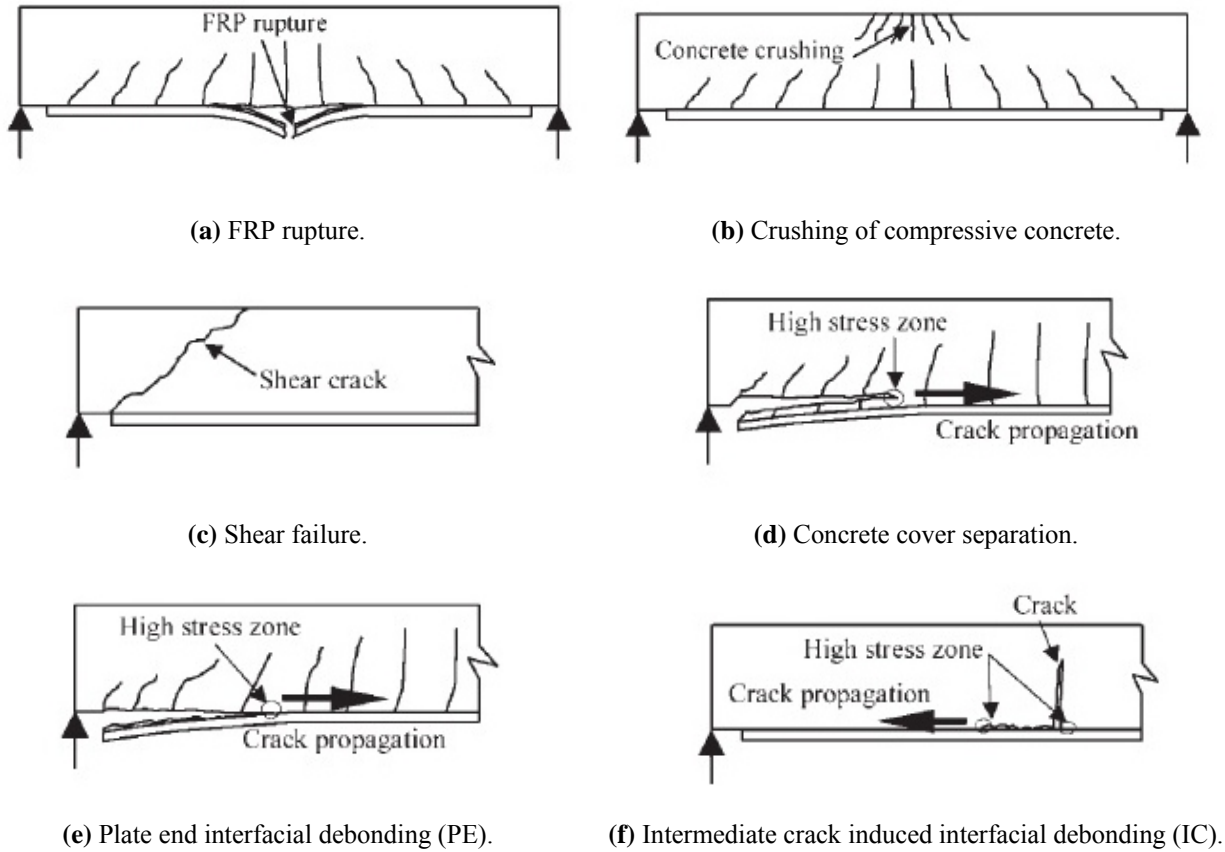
Primary failure modes of FRP-strengthened reinforced concrete beams (Smith and Teng, 2001).
